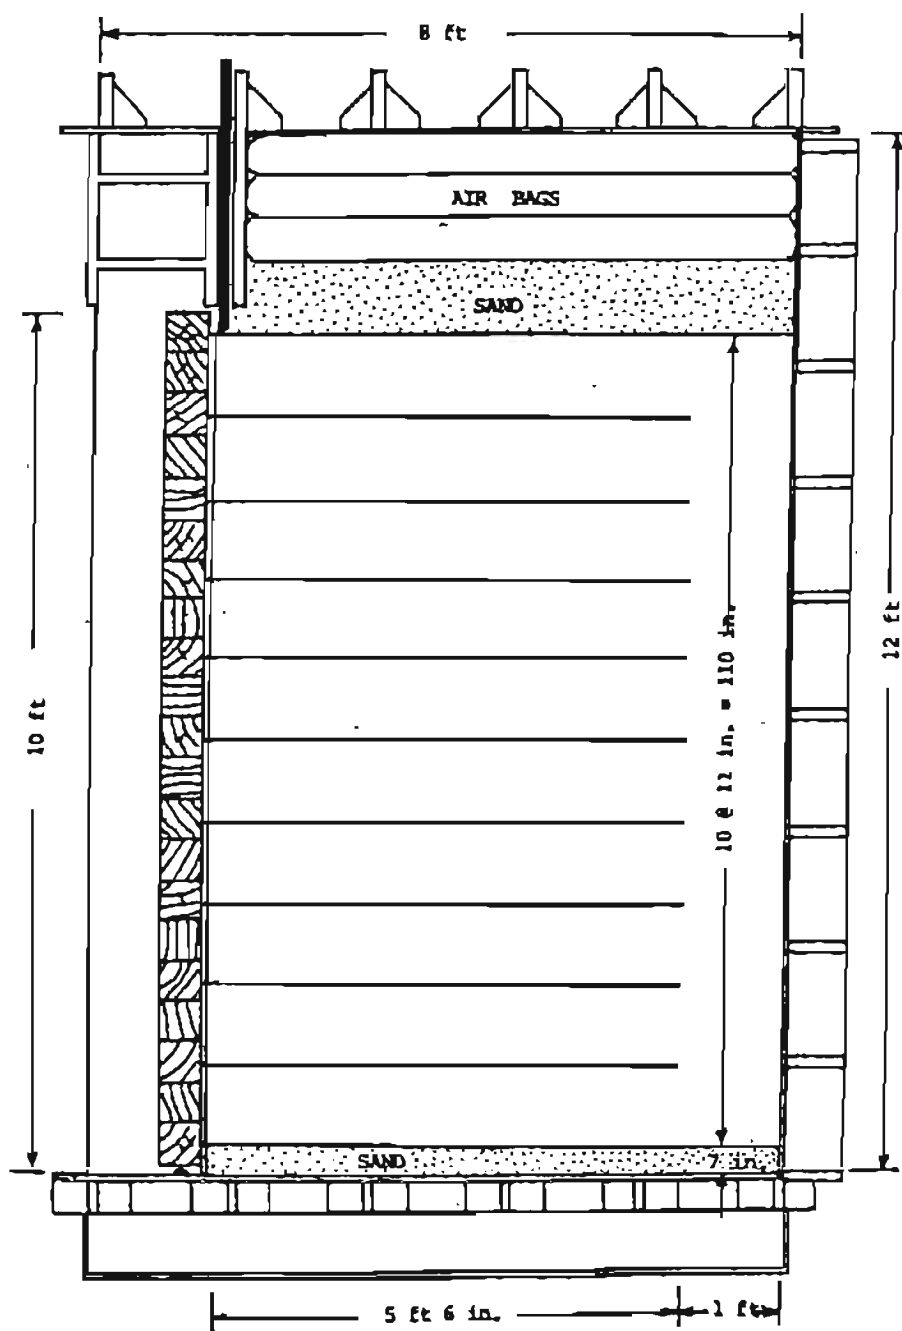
Loading Facility and Configuration of the Denver Test Walls (After Wu, 1992)
